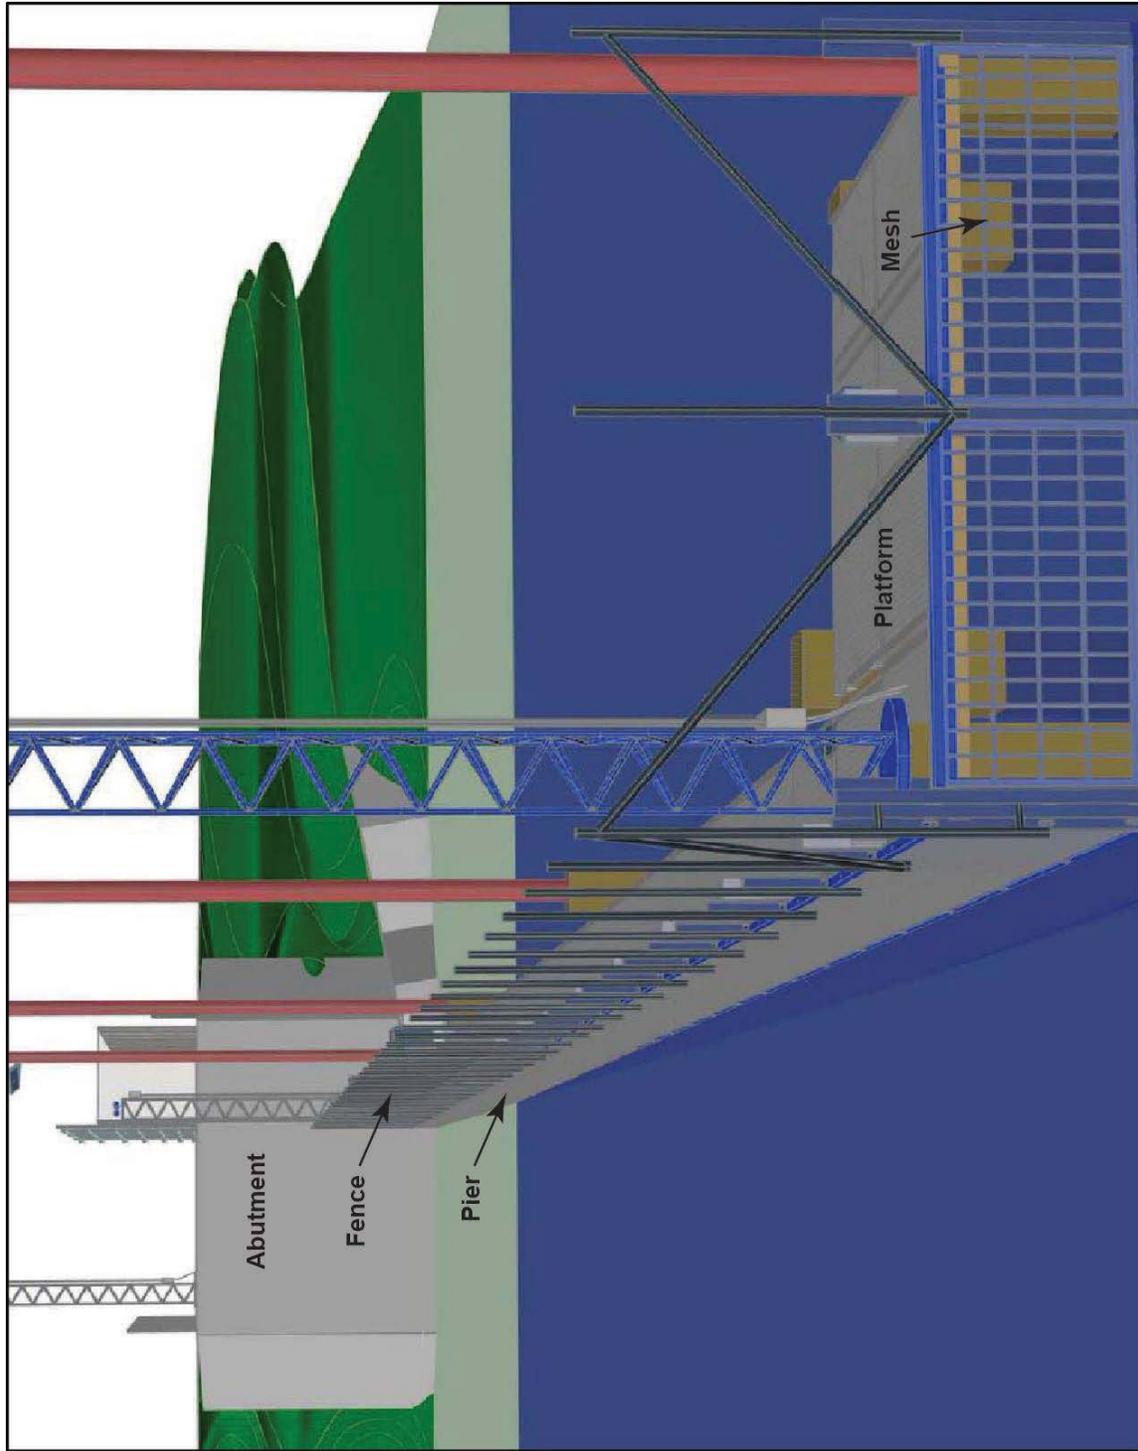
LWI Alternative 2: Pile-Supported Pier Alternative (end view, North LWI)
